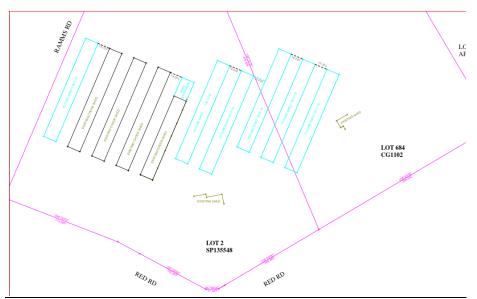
Proposed Site Plan footprint of existing and proposed new buildings.
